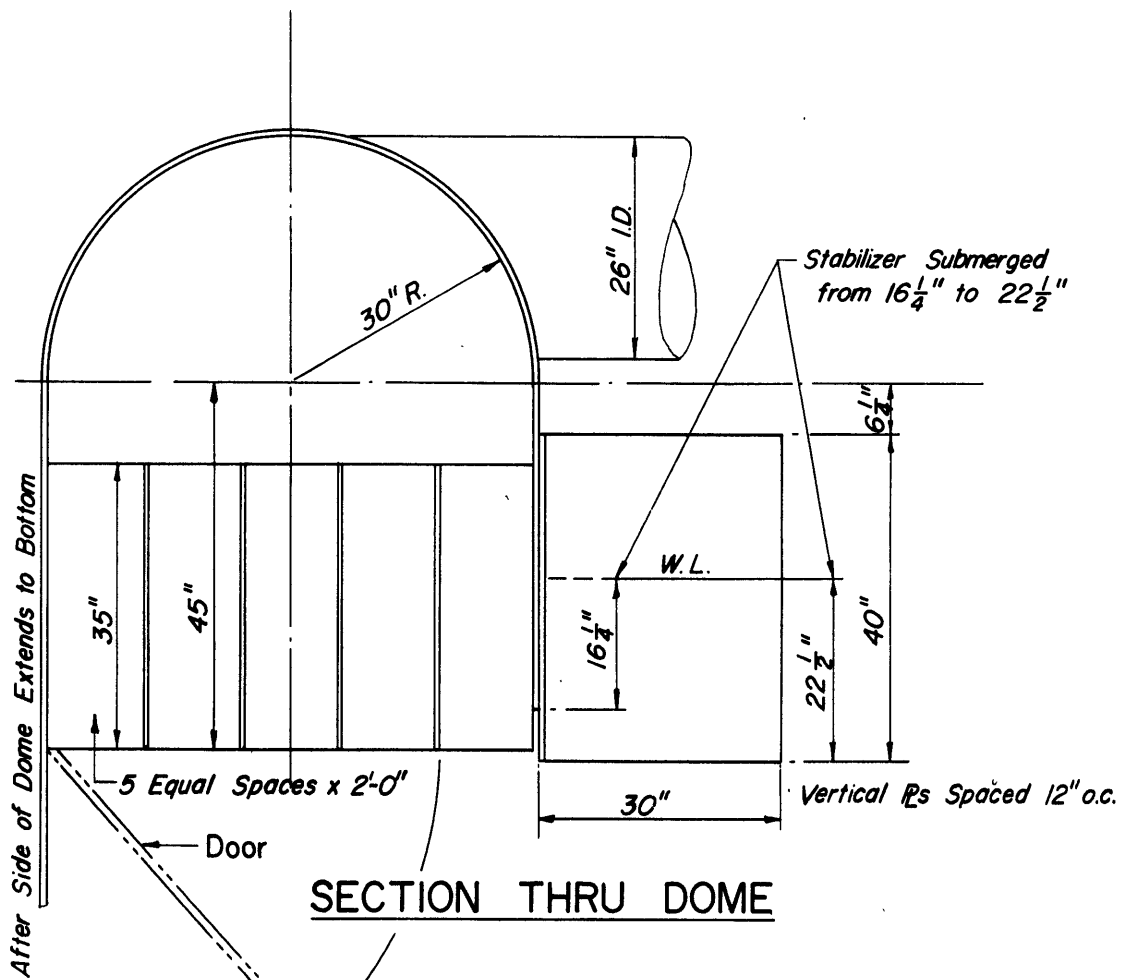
Schematic Section Through Dome and Valve Arrangement
